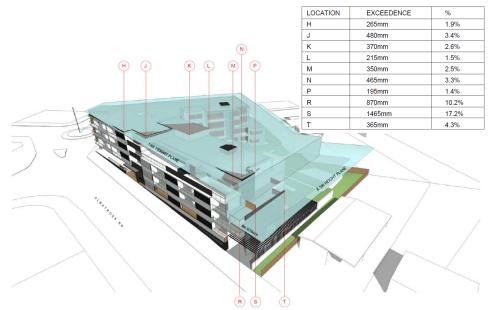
Height Plane instructions relating to the 14.0m (N2) and 8.5m (I2) maximum building height - southwestern view from Albatross Street.
